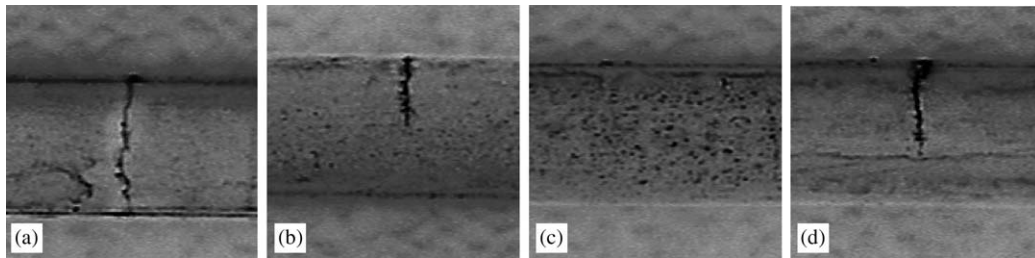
Photographs of the four sides of the cracked Beam 2 using the liquid penetration technique.
